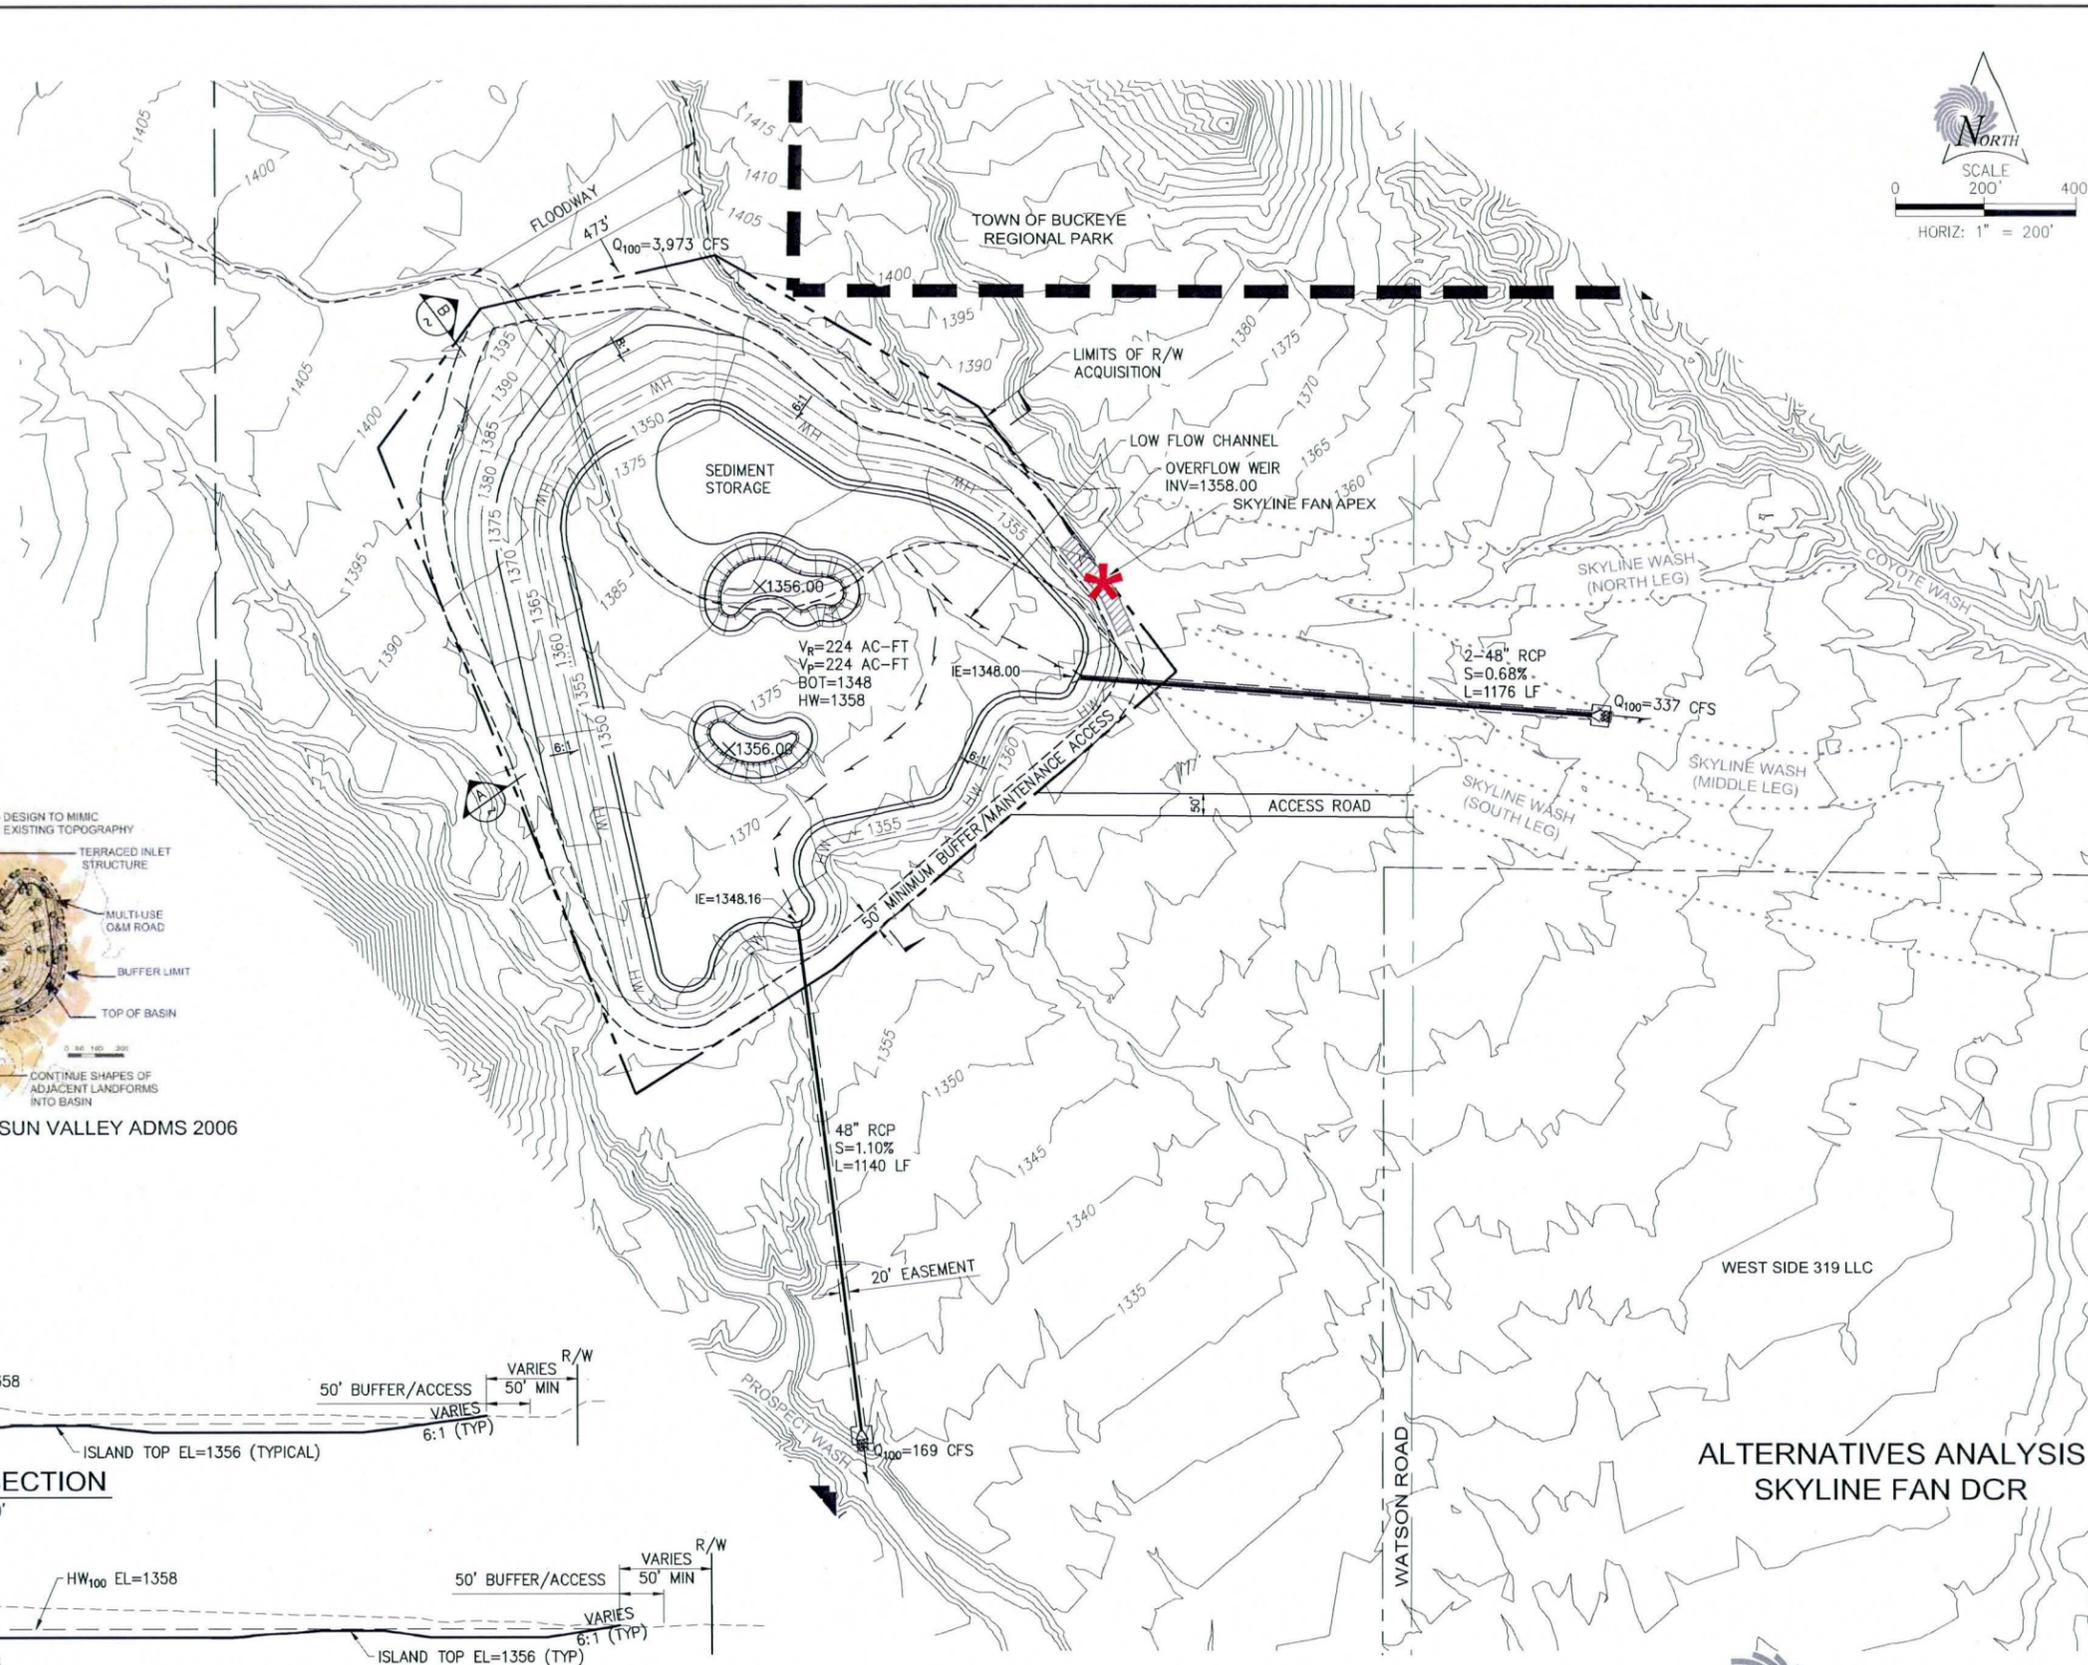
ALTERNATIVE 1B CONCEPT PLAN
